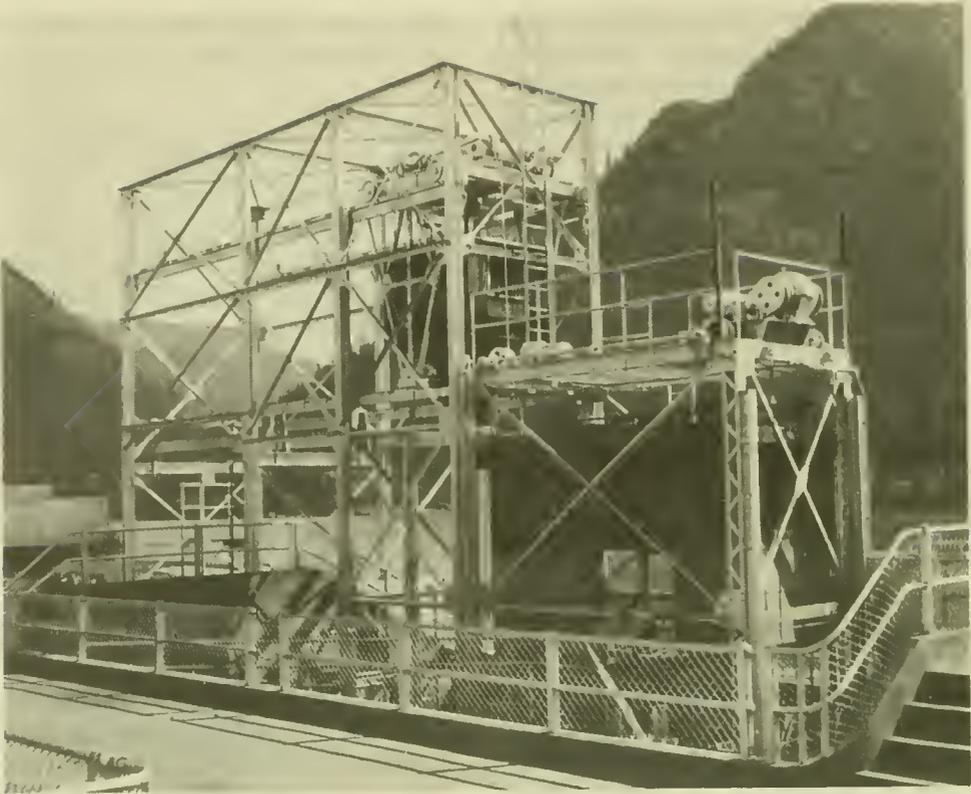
Trapping facilities, Washington shore fishway, Bonneville Dam.
